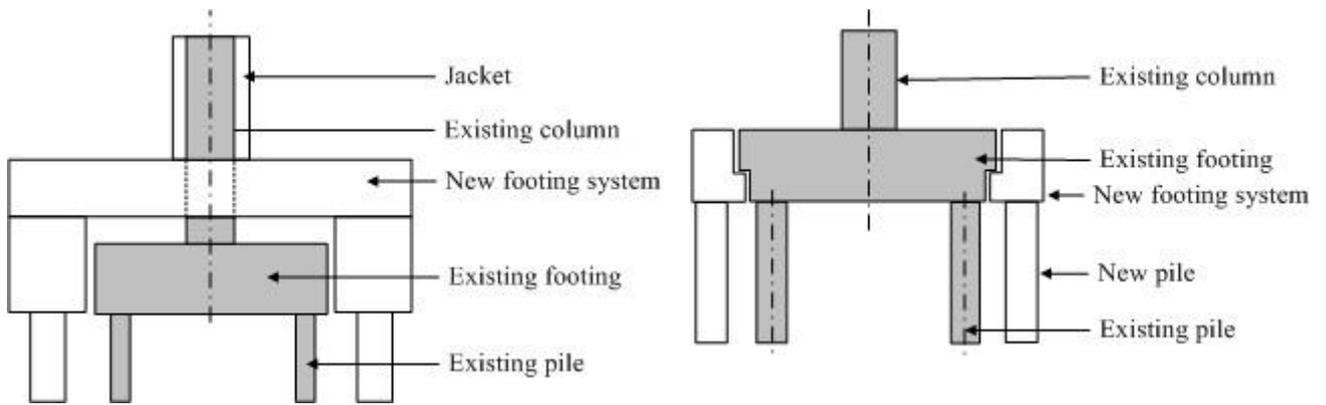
Strengthening of existing foundation (a) Bridging (b) Additions
